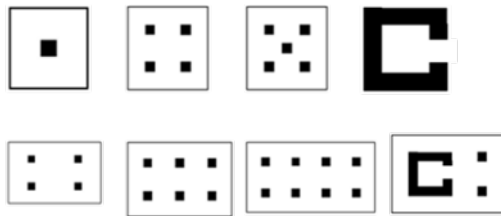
Majapahit building types in relief are based on the number of pillars and walls [11].
